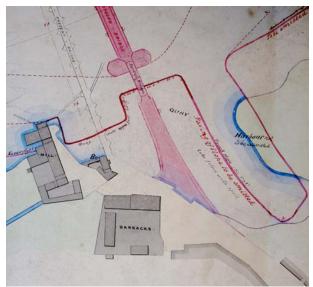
Detail of Shannon Commissioners survey drawing with proposed new quay, harbour wall, bridge & bridge ramp indicated in red with land 'to be filled with spoil'. (Waterways Ireland Archive, Enniskillen)
